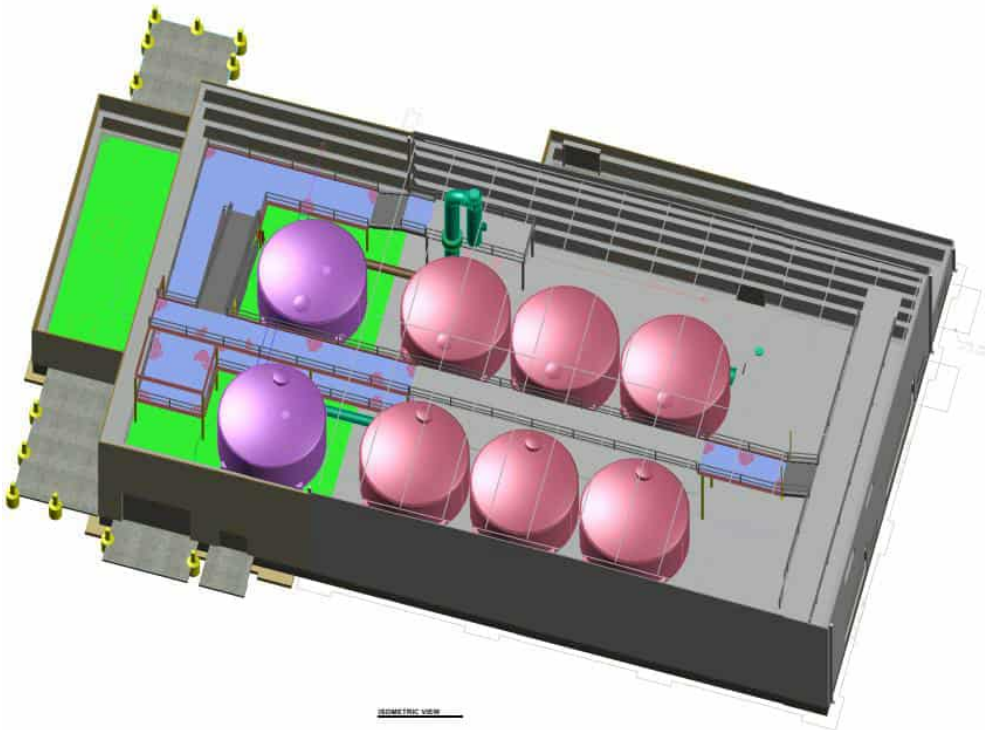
Proposed Rolling Mill CCW Site Plan Upon Project Completion
